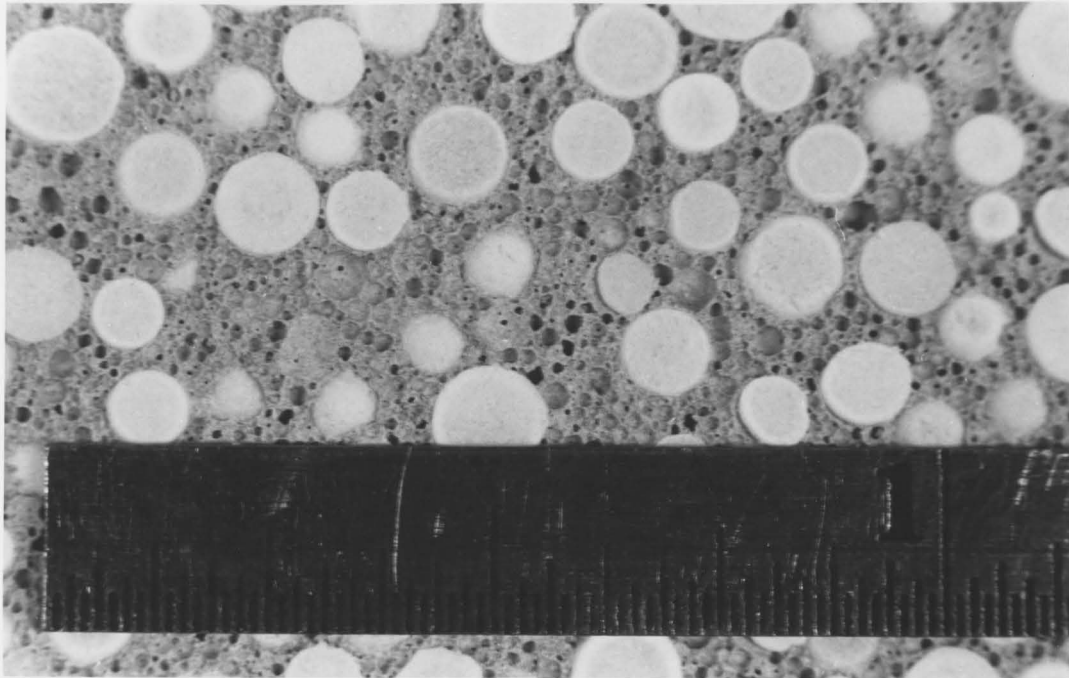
CROSS SECTION OF DYCON CONCRETE
